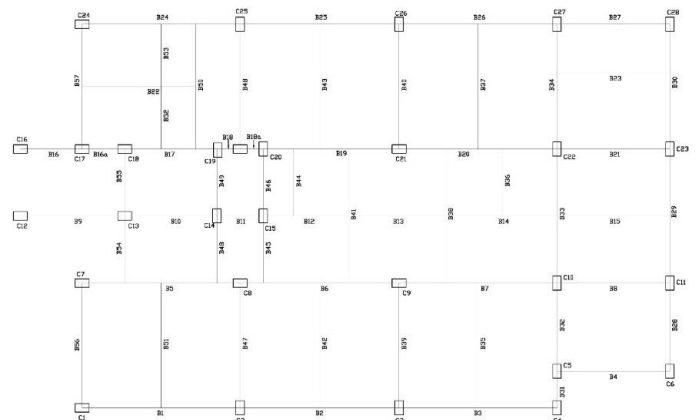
Typical Floor Plan (Showing Beam & Column Numbering)
